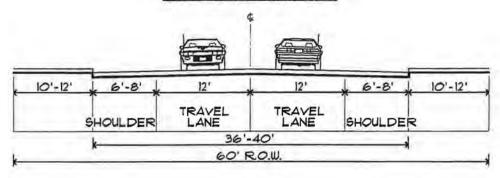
RURAL STREET DESIGN STANDARDS
